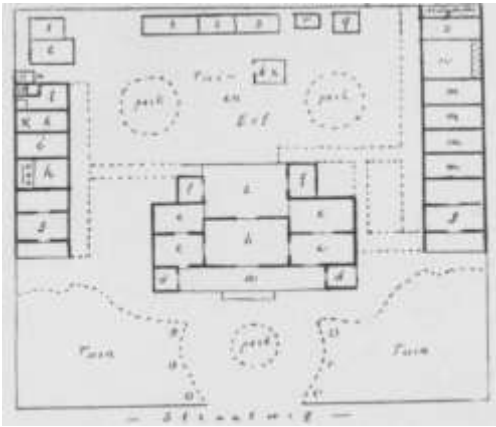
A gentleman's houseplan, a: front gallery, b: central gallery, c: back gallery
